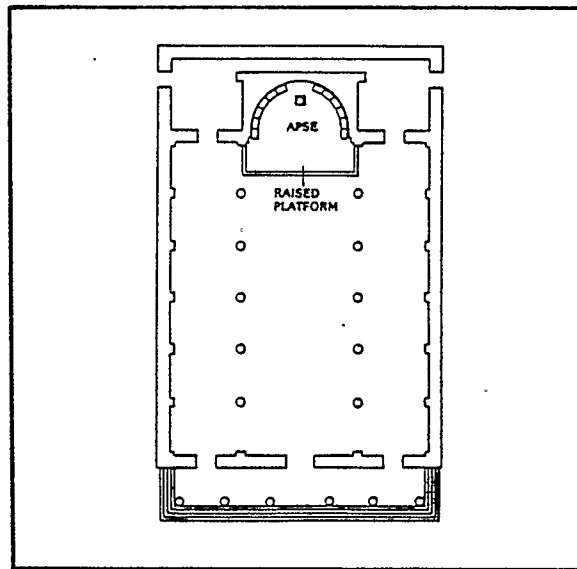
Basilica Floor Plan (ca. 4th Century A.D.)
